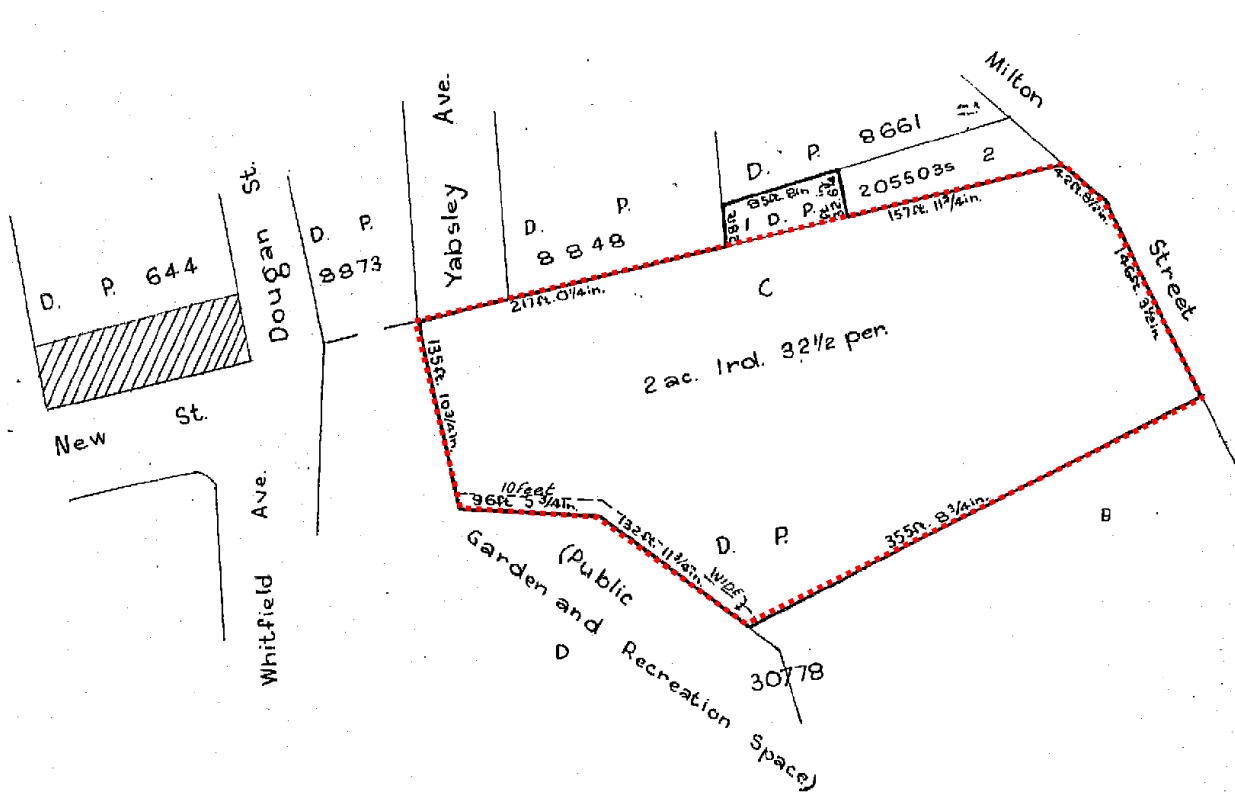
Block plan of site after closure of brick factory, boundaries of subject site identified.
